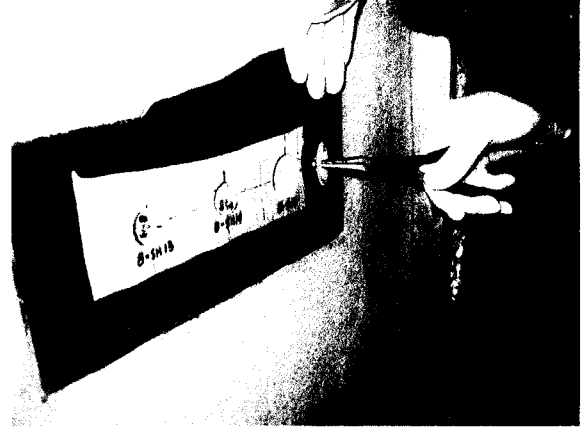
Collecting gravimetric samples in a stucco wall assembly
